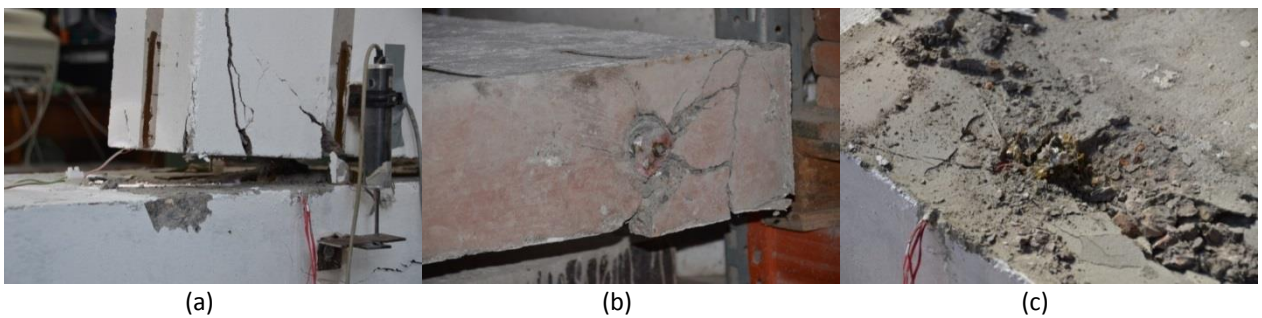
Test A1D25M-G: Damage observed at the end of the reversed monotonic loading: (a) & (b) severe damage to the panel on the tension side; (c) severe damage to the beam on the tension side.
